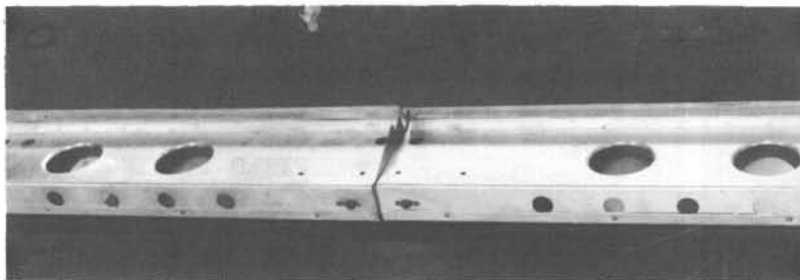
Shelter # 2 Aluminum grade beam typical joint.
